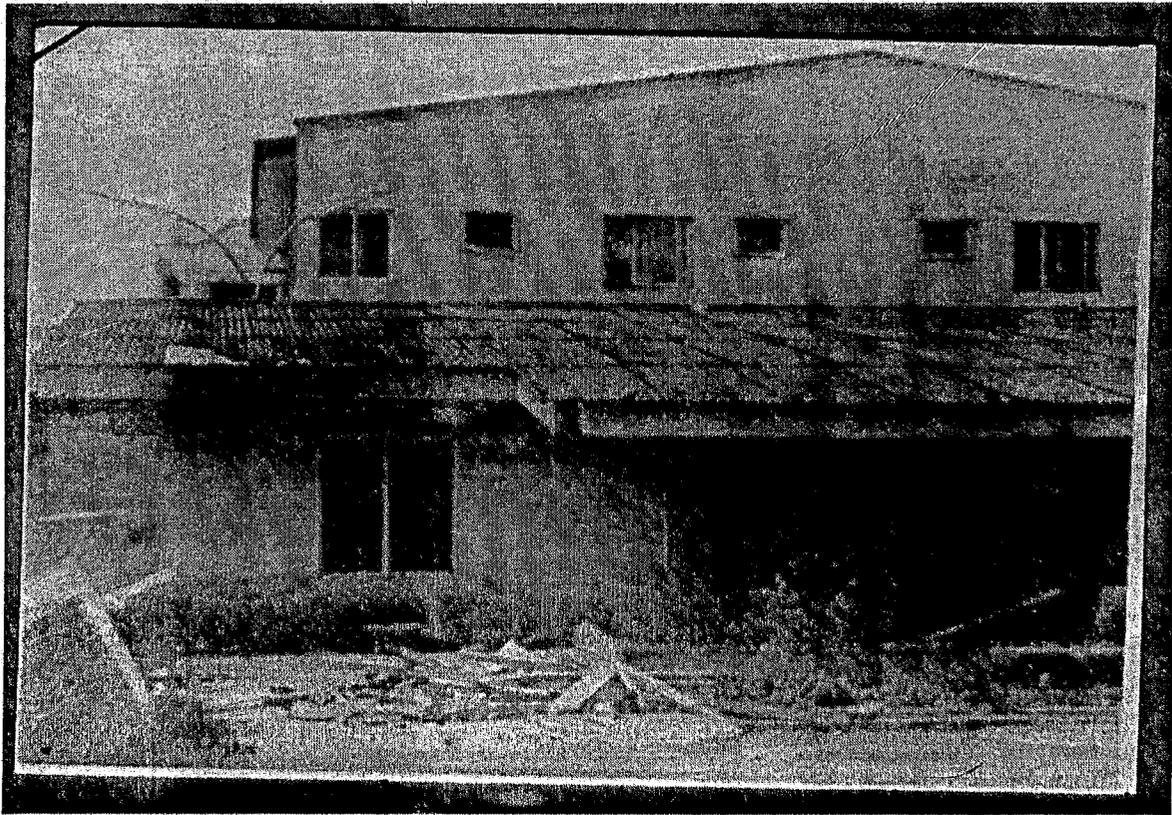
2-bedroom housing unit showing damage caused by rising damp
